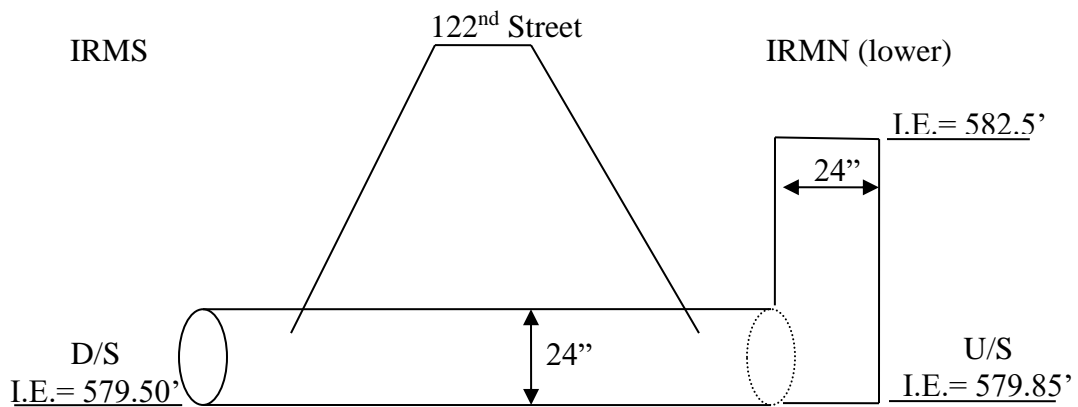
A culvert structure connecting IRMN (lower) to IRMS (Structure 3).
